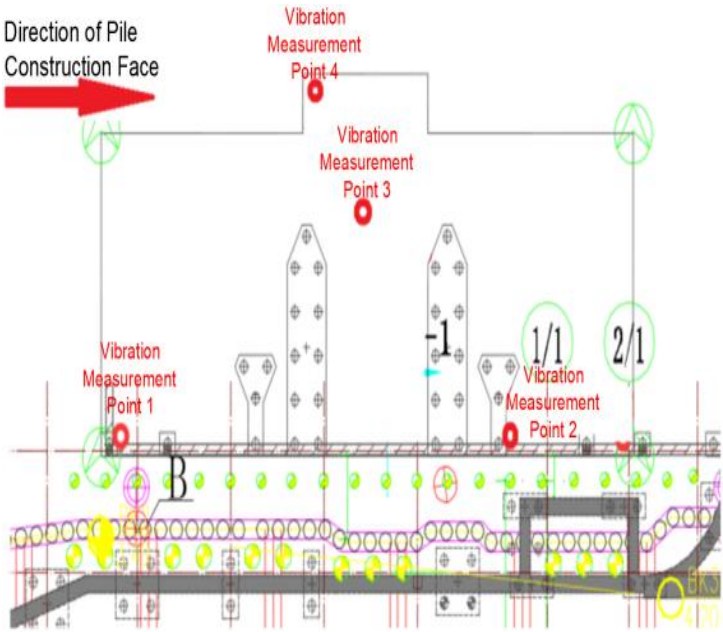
Vibration Test Point Layout Diagram (Top Floor)
